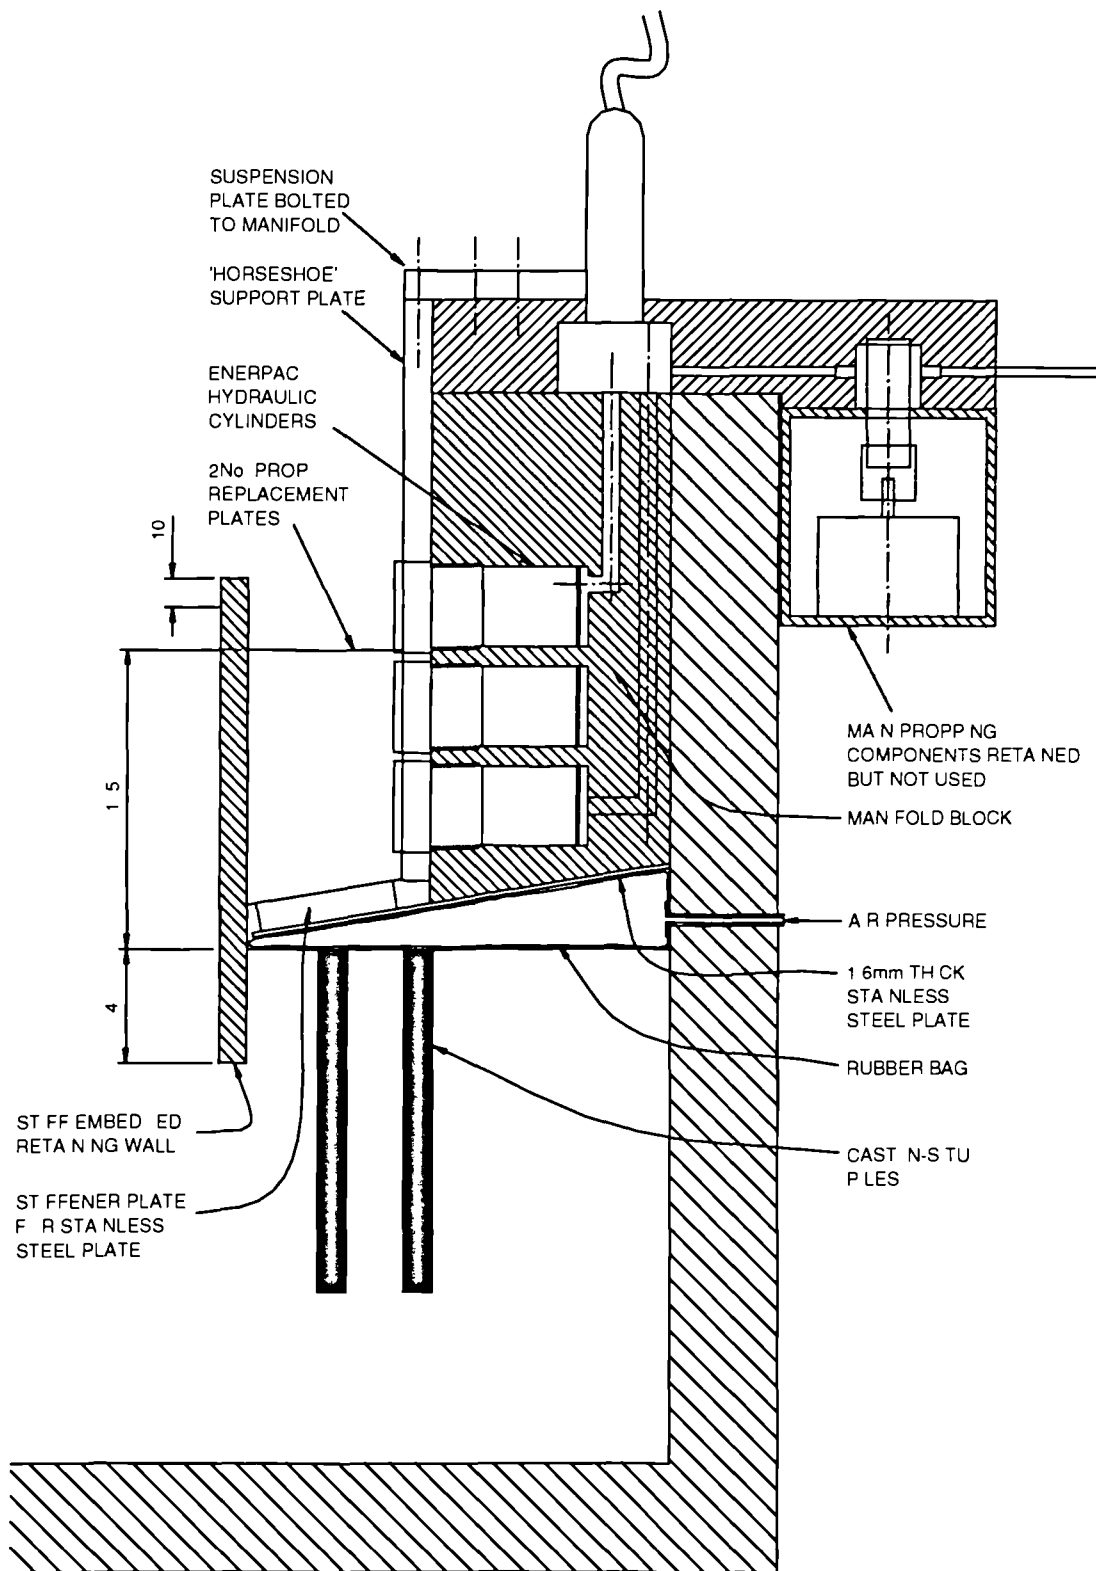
General details of the modified apparatus used to ensure negligible horizontal wall movement in test AM10, AM11 and AM12.
